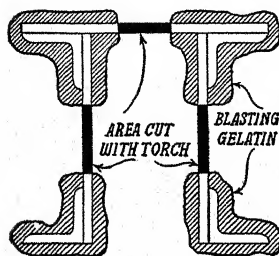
Cross section of a truss member showing Blasting Gelatin in place
